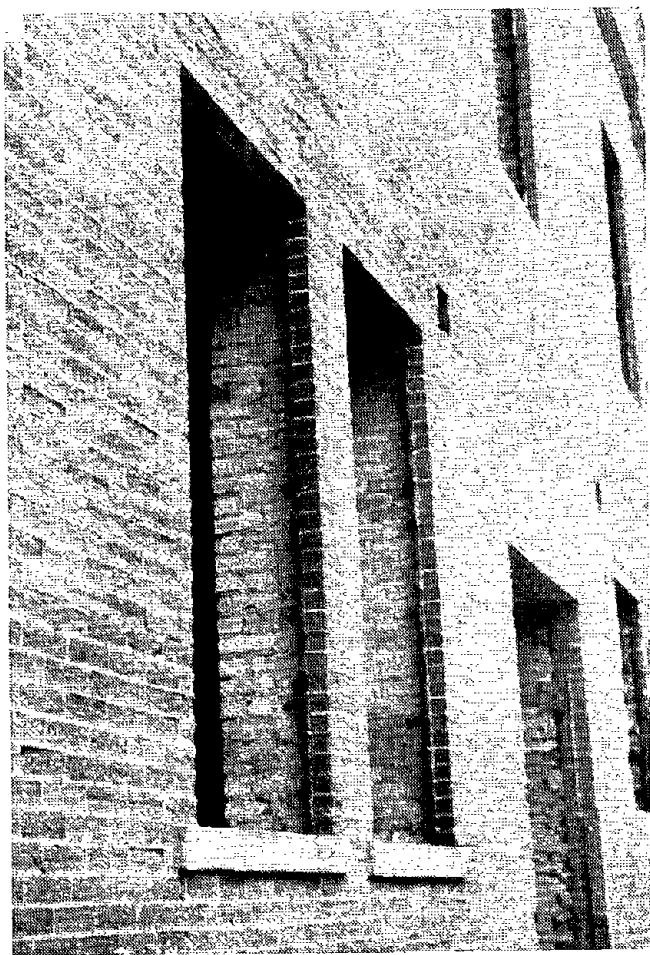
URM MASONRY, SALT LAKE CITY, UT.
